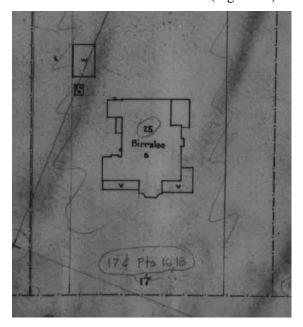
Birralee*, c.1929 Source: Metropolitan Water Sewerage and Drainage Board Block Plan dated 1929
